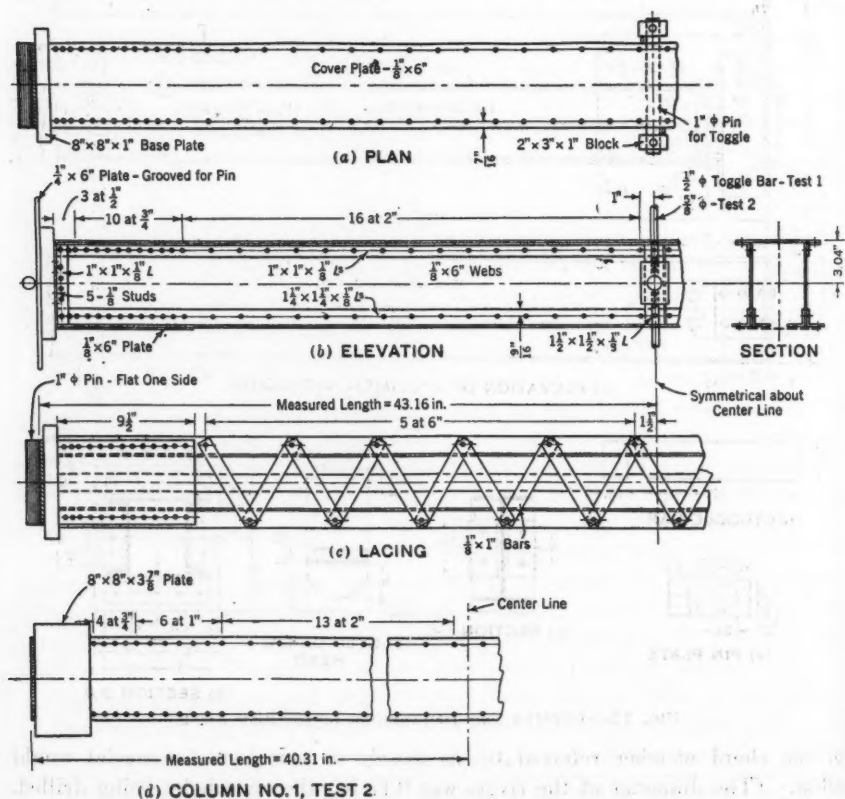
DETAILS AND DIMENSIONS, COLUMN NO. 1.
